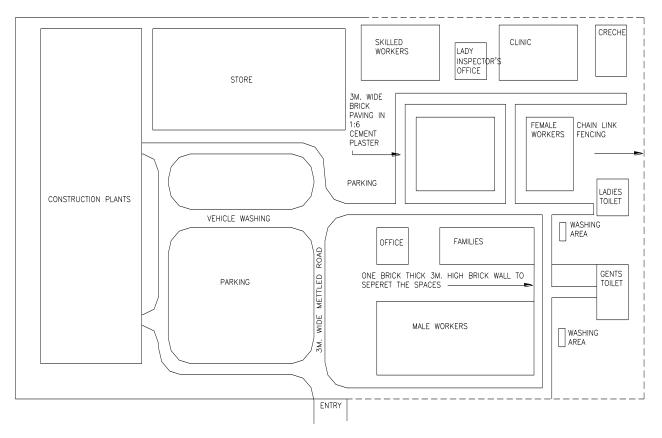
FIGURE A: TYPICAL LAYOUT OF CONSTRUCTION CAMP
